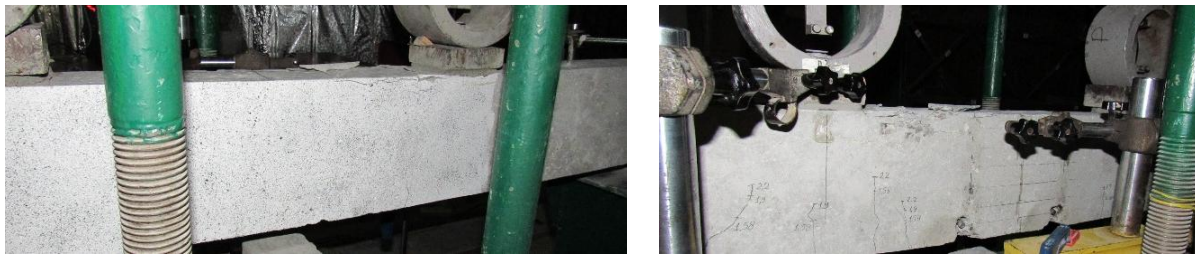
The destruction of the RC beam occurred within the compressed concrete zone.
